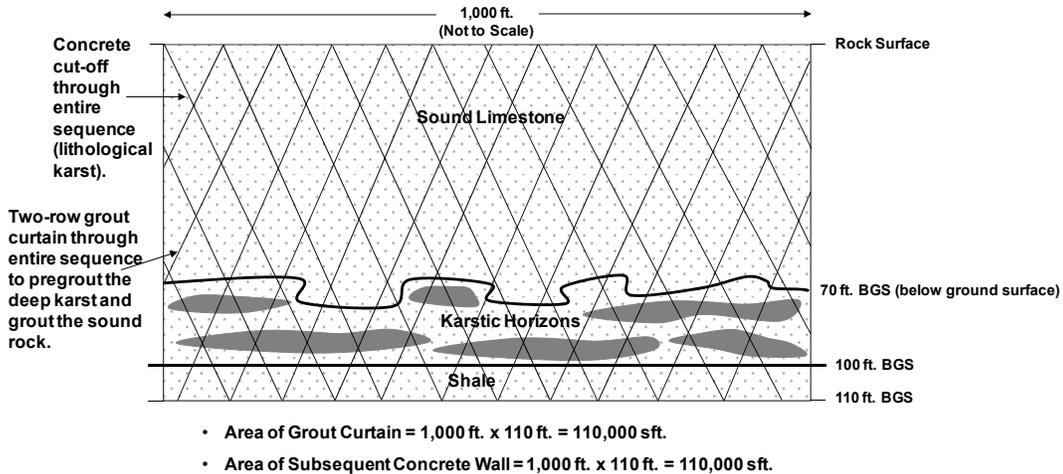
Heavily karstified horizons are found at depth during predrilling and grouting. Therefore the concrete cutoff is required for the full extent. The grouting has pretreated the karstic horizons to permit safe concrete cutoff construction.
